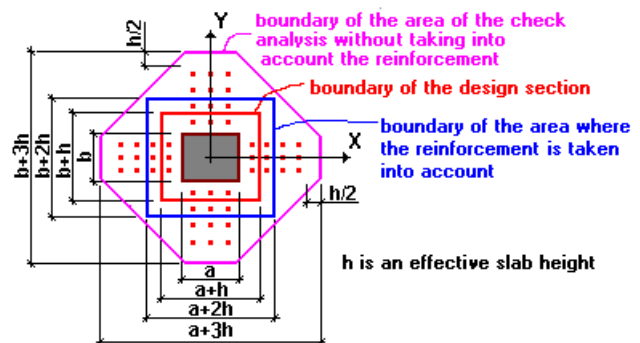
Areas of the slab for the checking analysis, cross-shaped arrangement of reinforcement
